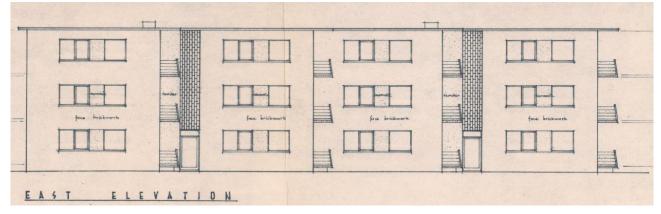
East elevation, Shirley Grove (Source: Council Building File)
